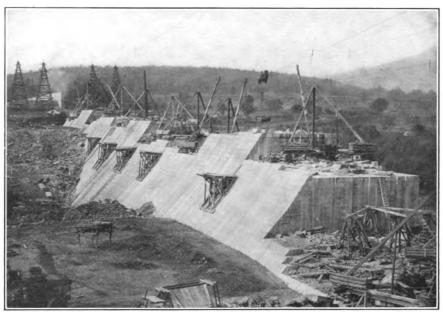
Fig. A.—Olive Bridge dam. Note vertical steps at expansion joints, also landing stages on down stream face.
